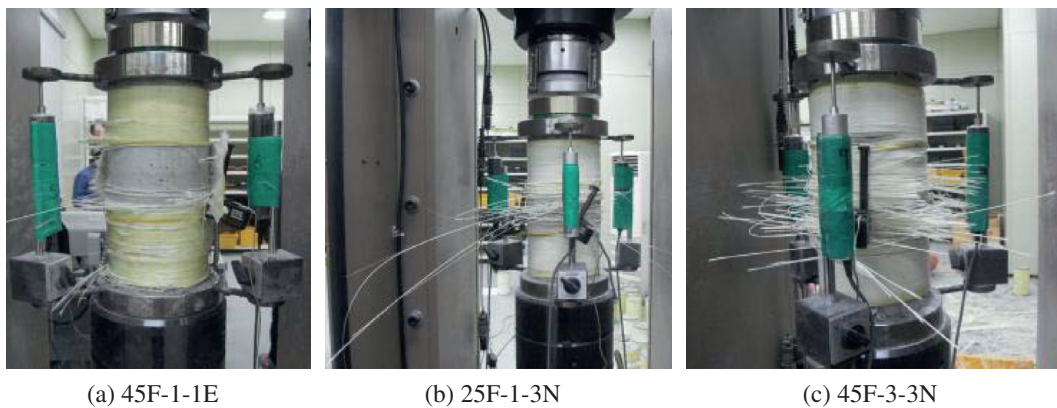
Fracture-types of FRP wire jacketed specimens.
